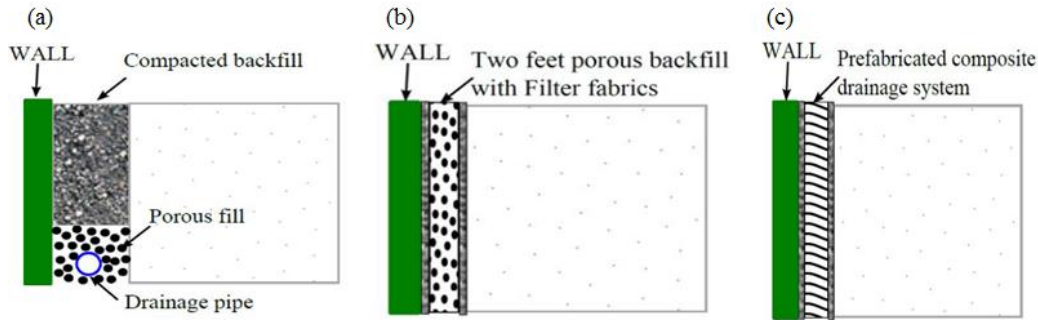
Different drainage methods: (a) porous backfill around drainage pipe, (b) porous backfill with geotextile, (c) geocomposite drainage system [5]
